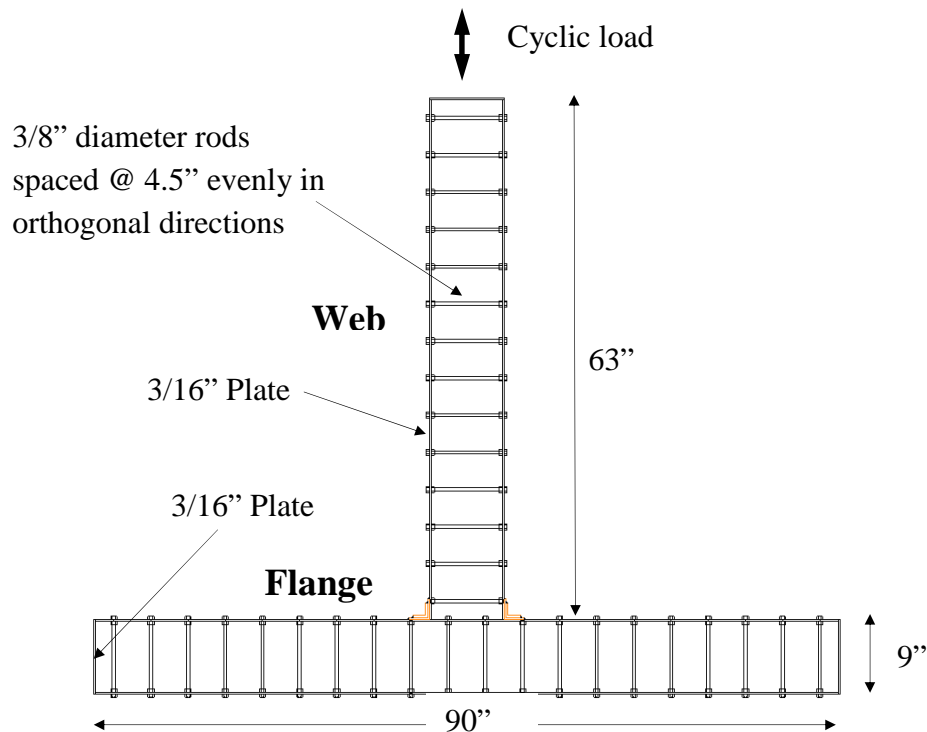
T-shaped intersecting wall specimen (3/8-scale of prototype)
